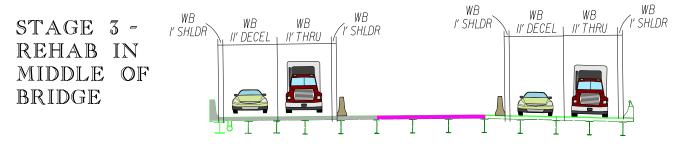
Split through traffic on I-64 WB bridge over Tidewater Drive
